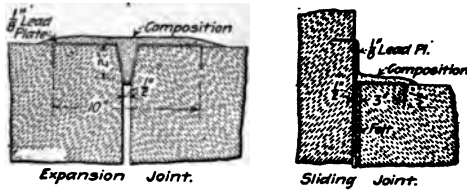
Expansion Joints, Big Muddy Bridge, Illinois Central R.R.
